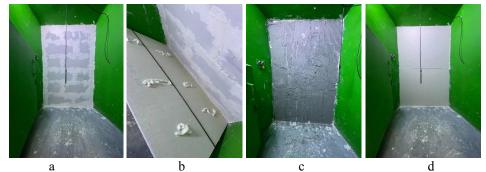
Photo of the back wall of a small sound measuring chamber. A wall made of aerated concrete blocks (a), point fastening of the moisture-proof gypsum fiber sheet (b), solid fastening of the moisture-proof gypsum fiber sheet (c), moisture-proof gypsum fiber sheet glued to the wall of aerated concrete (d)
